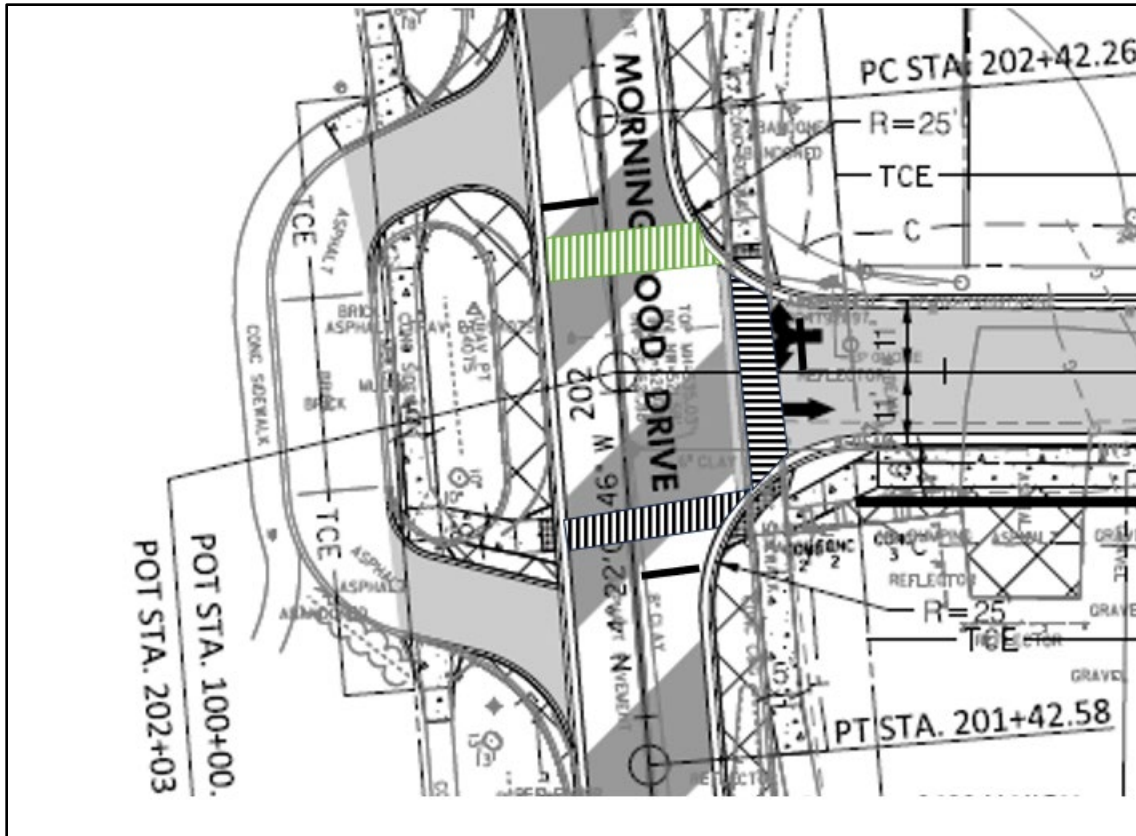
Proposed North High Street/Morningwood Drive Intersection Missing Crosswalk
